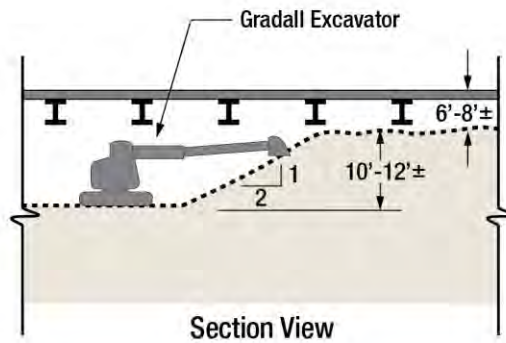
Plan Showing Excavation Procedure of Shallow Lifts with Low-Profile Gradall Excavator
